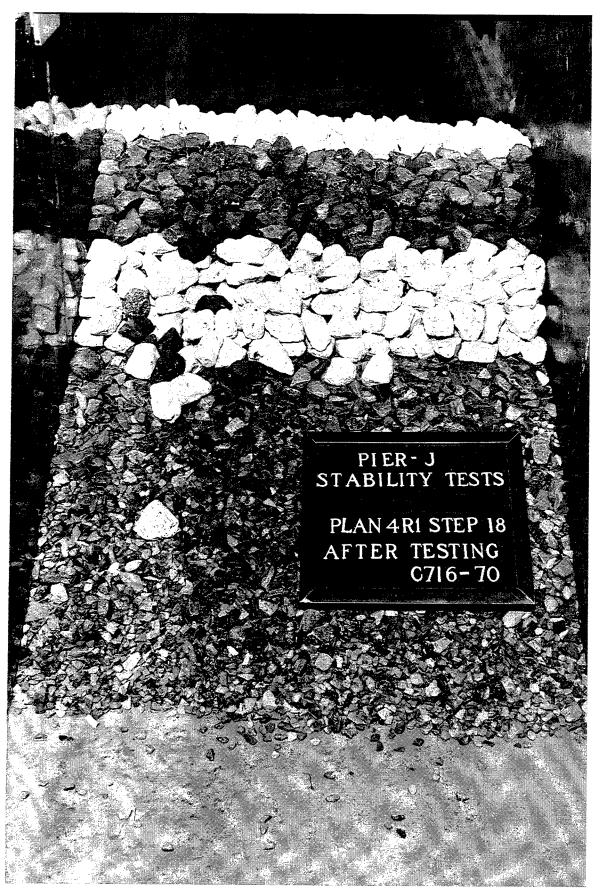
Harbor-side view of Plan 4R1 after testing step 18 of Hydrograph 3A
